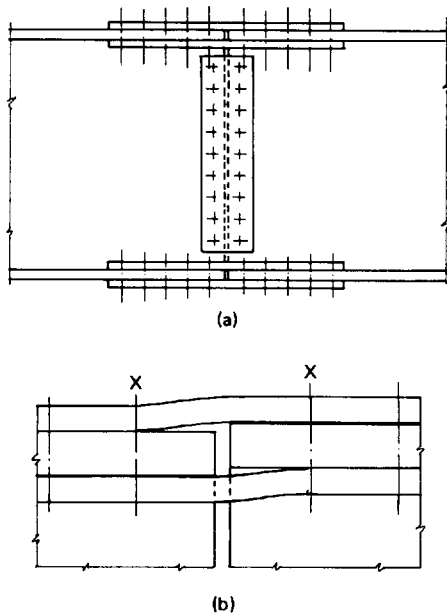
Bolted beam splice. (a) General arrangement; (b) detail at flange junction, showing effect of mismatched sections
